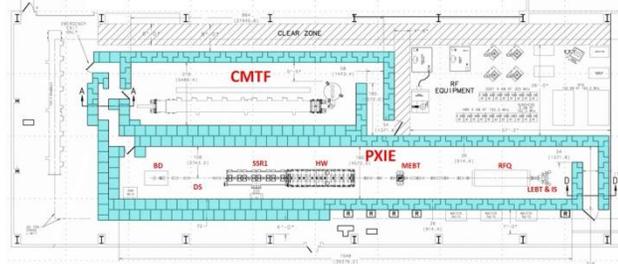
Plan view of PXIE accelerator in concrete enclosure within CMTF.
